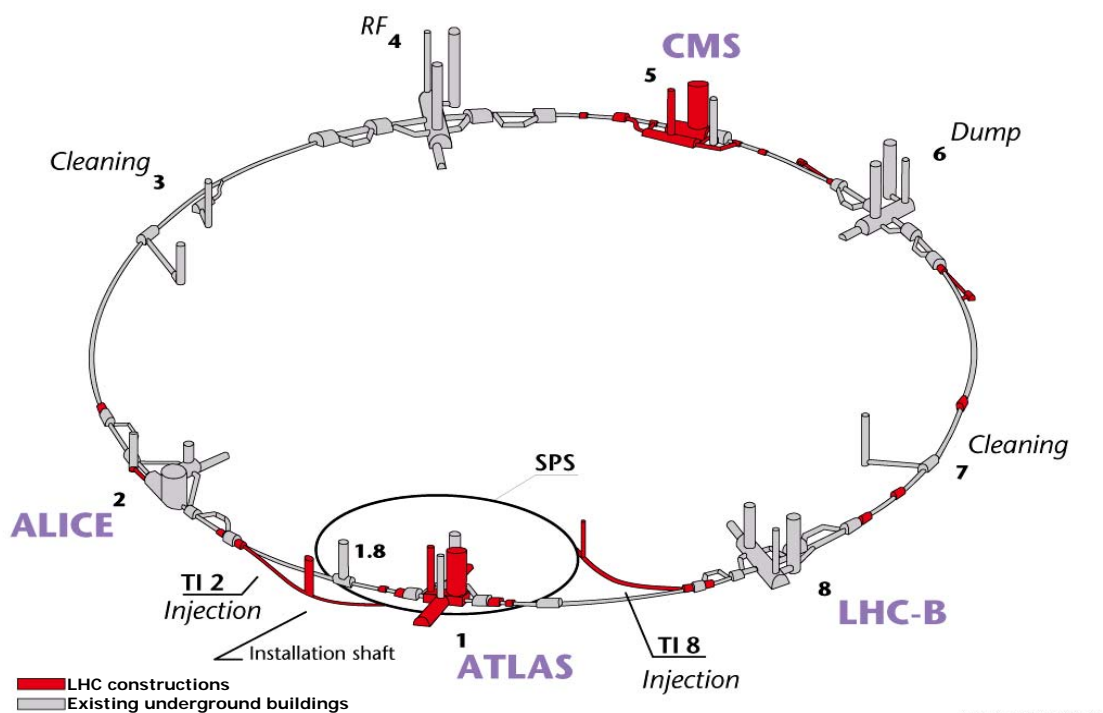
Layout of the LHC tunnel, including new infrastructures.
